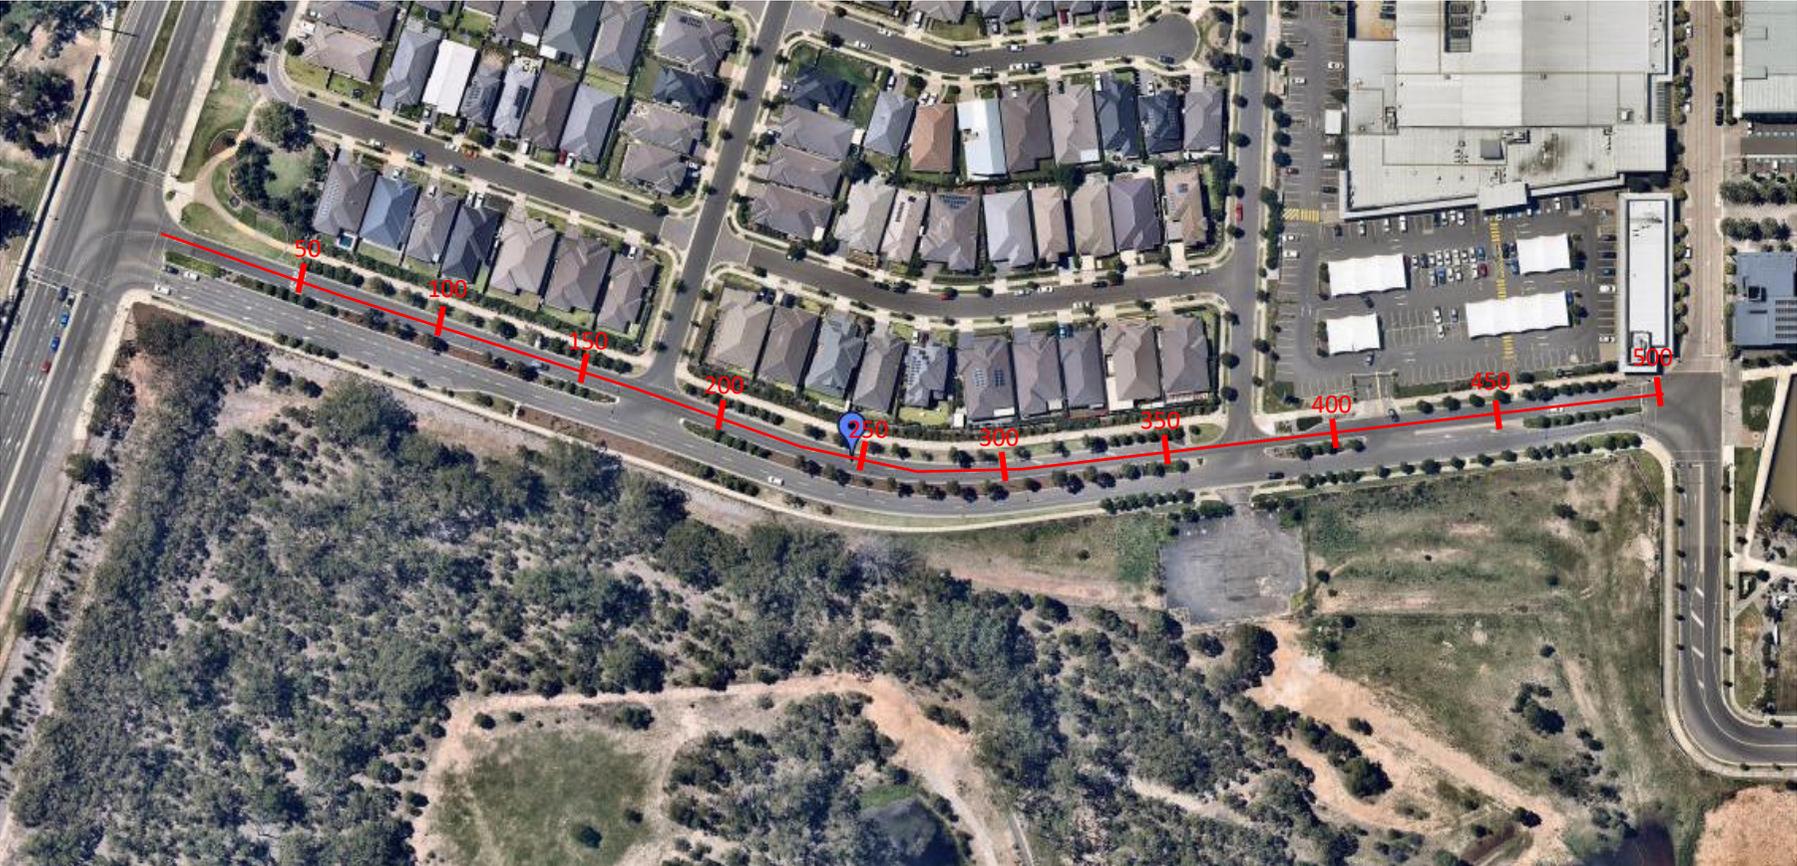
Approx CH250 EB pavement failure (P53)
